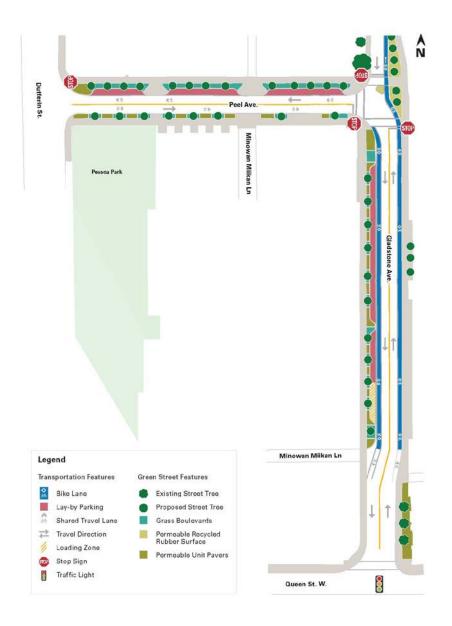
A plan rendering of the proposed improvements on Gladstone Avenue and Peel Avenue.
